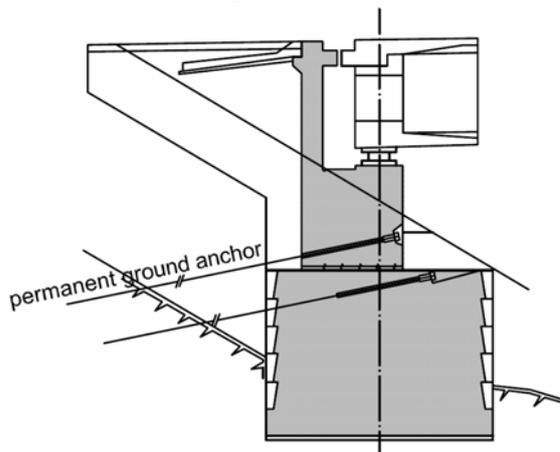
Anchoring a well and an abutment in a steep slope
